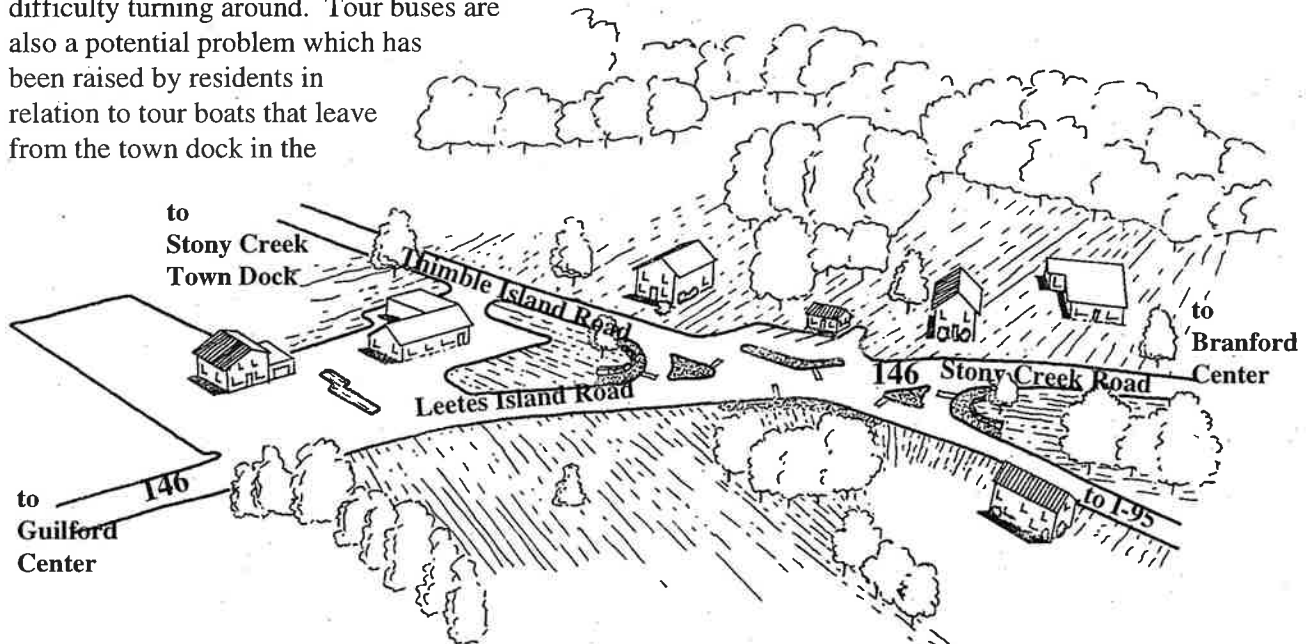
Aerial sketch (looking southwest) of how tightening the geometry and reducing pavement can improve safety and slow speeds at the intersection of Leetes Island Road and Stony Creek Road.
